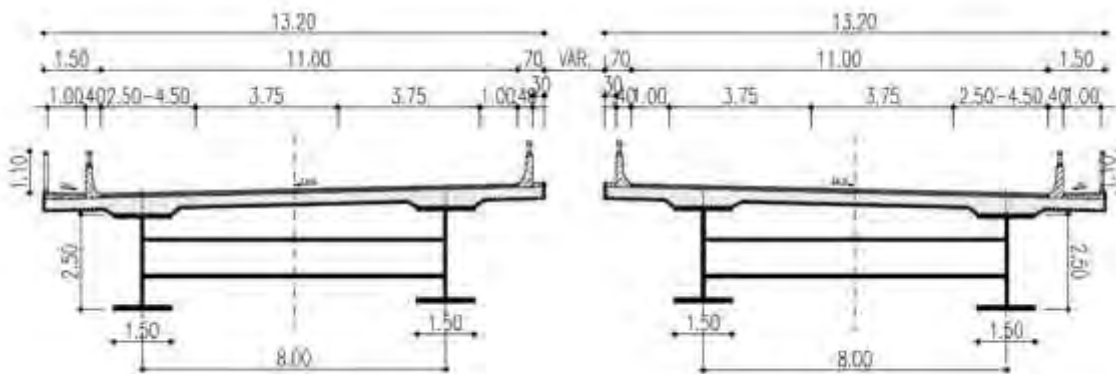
For pre-stressed precast PSC beams bridges – type 2
